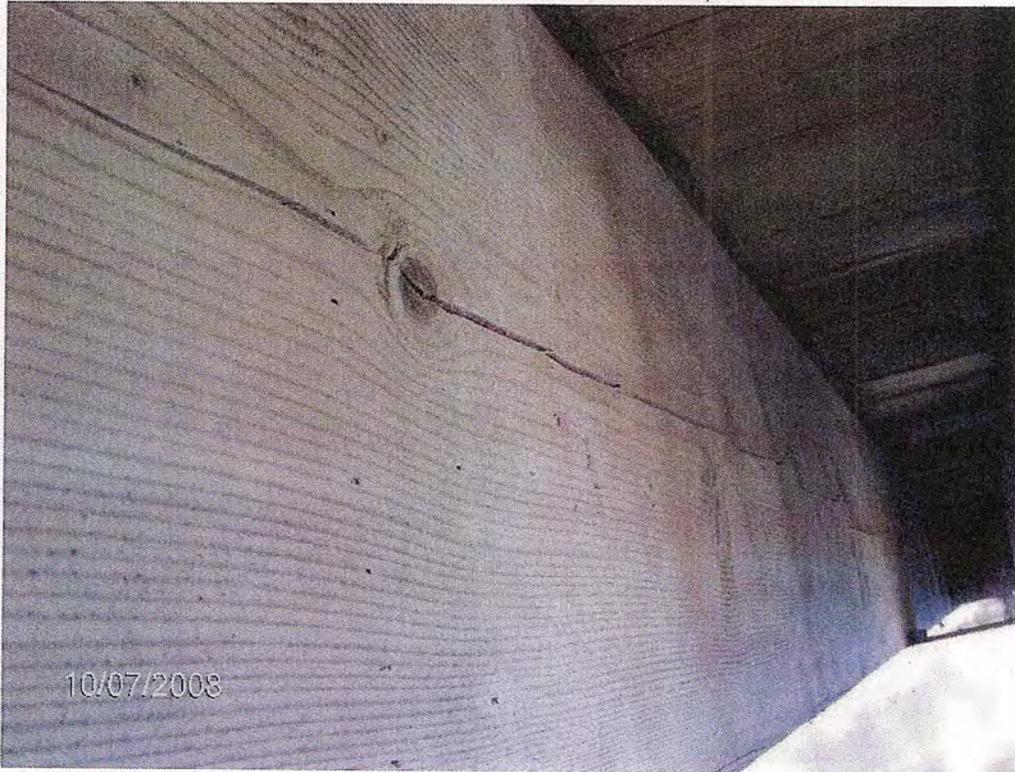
1/8" wide check in timber stringer S2 of span 10.
